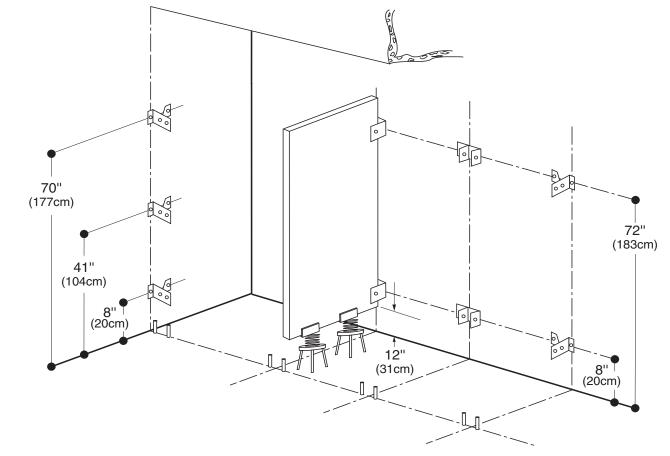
Overhead-Braced or Floor-to-Ceiling Anchored Alcove Closed Layout.
